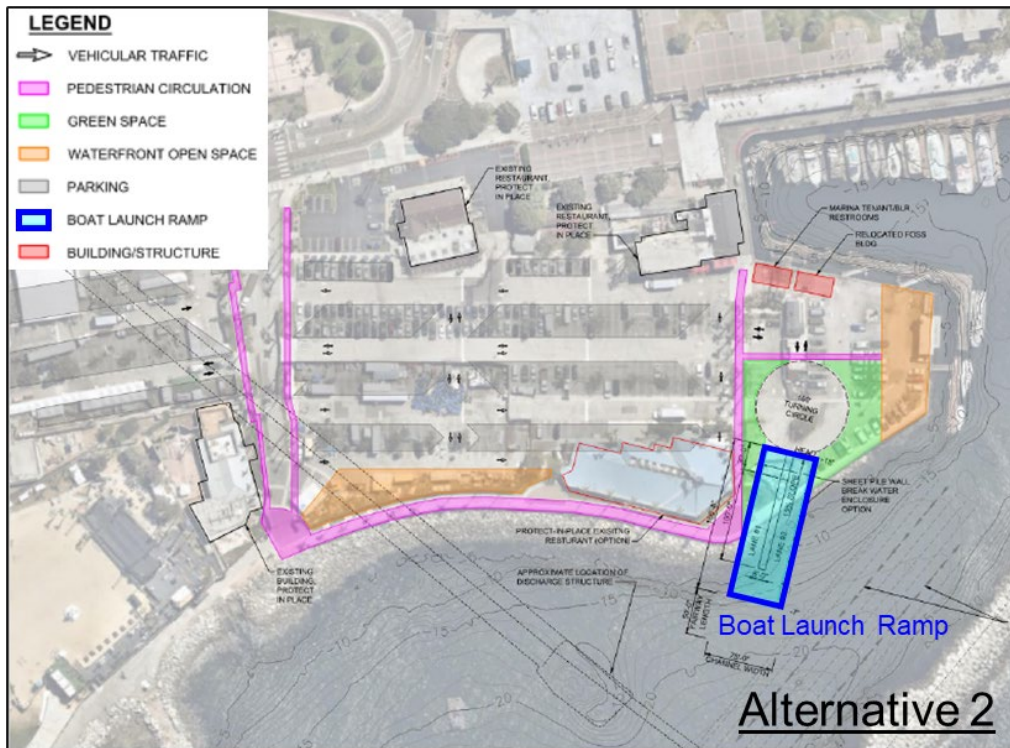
Boat Launch Ramp Placement – Alternative 2 (dated December 18, 2024).
